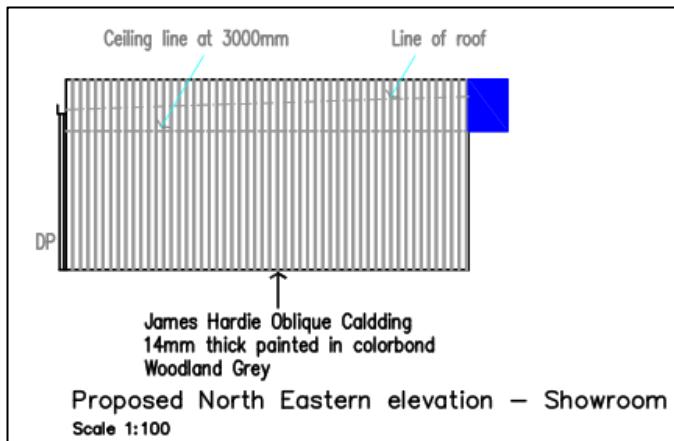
North-eastern elevation of sales building (Source: Badaoui Group, 2025)
